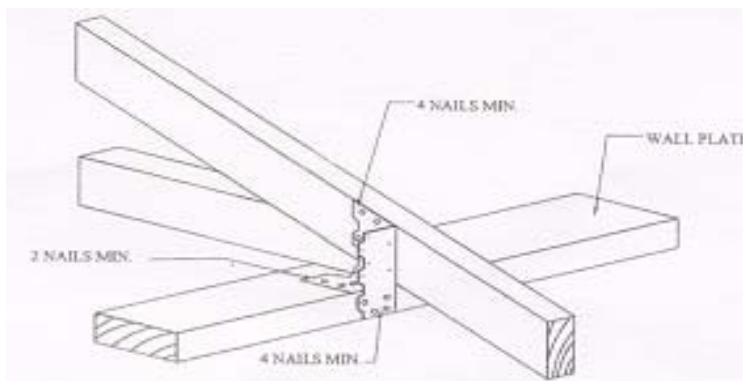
Roof Truss to Wall Plate Details Using one number Gang-Nail "Trip-L-Grip.
